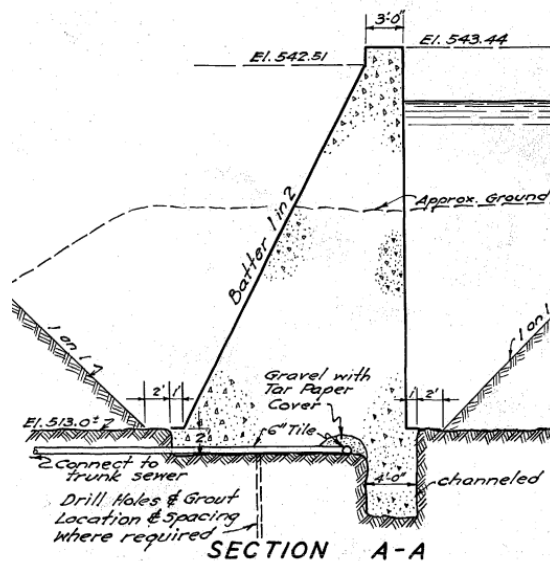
As-Built Mass Concrete Gravity Floodwall with a Shear Key within Vicinity of the existing I-80 Des Plaines River Bridge
